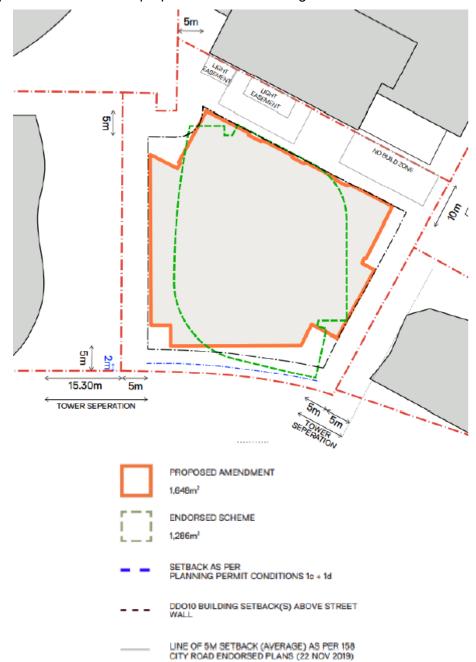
Approved and proposed tower floor plates (source: application documents prepared by SJB Planning)
